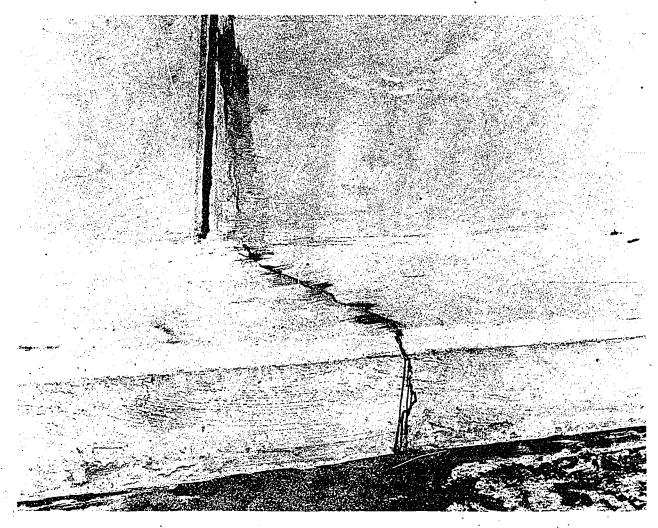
Crack through safety curb. Crack started at parapet joint and continued across curb and deck. See also figure 5-84.
